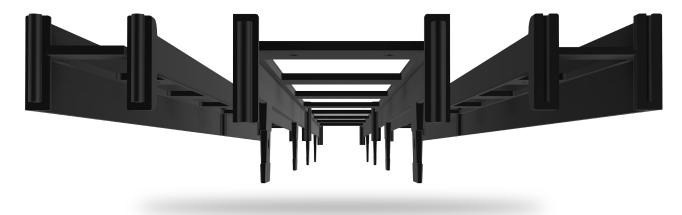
Embedded BuildBuck webs for attachment points and "T" concrete anchors.
